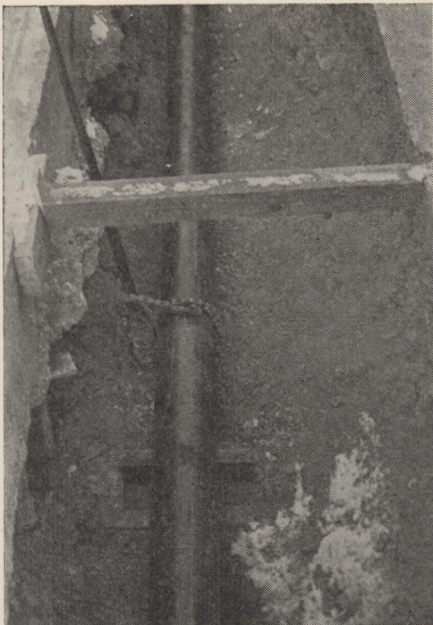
Section of 8-In. Pipe Showing Supporting Concrete Blocks.
